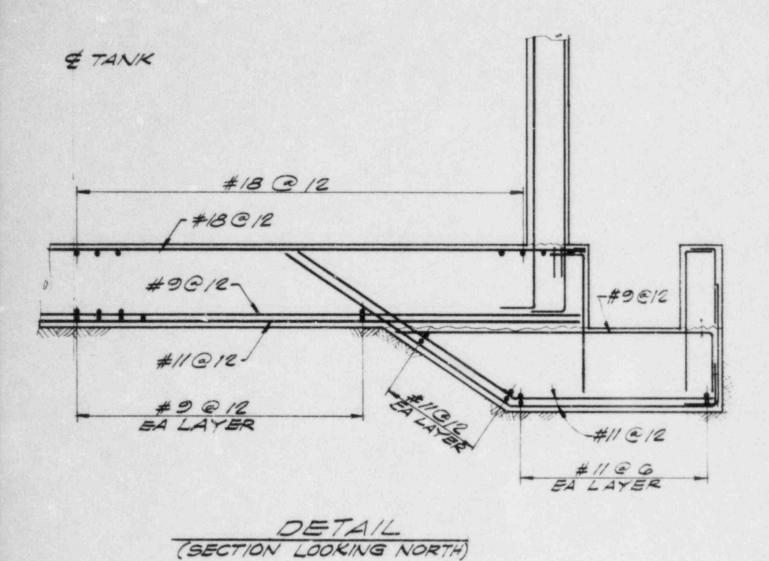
CONDENSATE STORAGE TANK BASEMAT REINFORCING DETAILS
